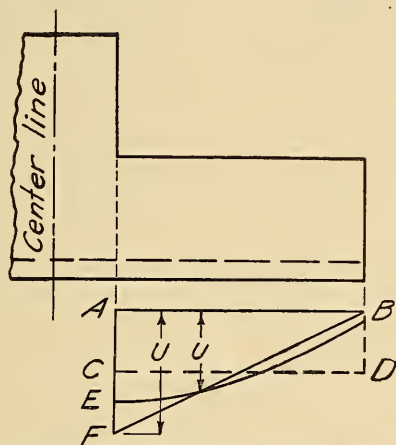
DISTRIBUTION OF BOND STRESS ALONG THE REINFORCEMENT IN A WALL FOOTING.
